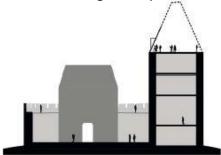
Crossection of castle. Source:(Gemeente Teylingen, 2015)
